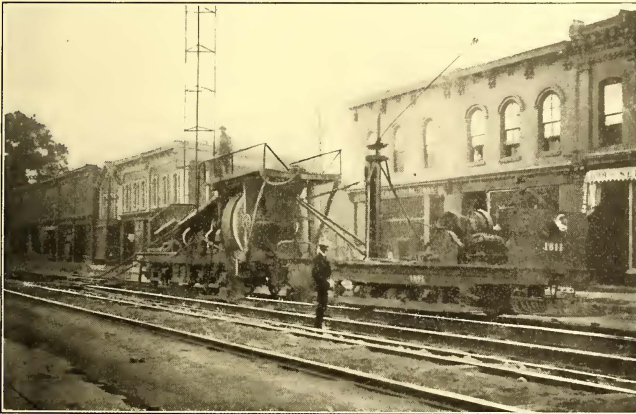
MIXER AT WORK IN CITY TRACK CONSTRUCTION
